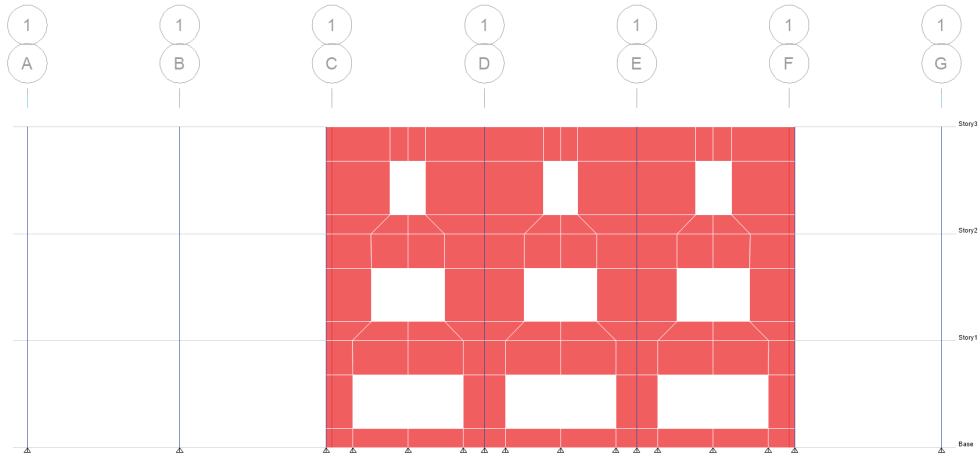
ETABS Model for Shear Wall Pattern No. 3.
